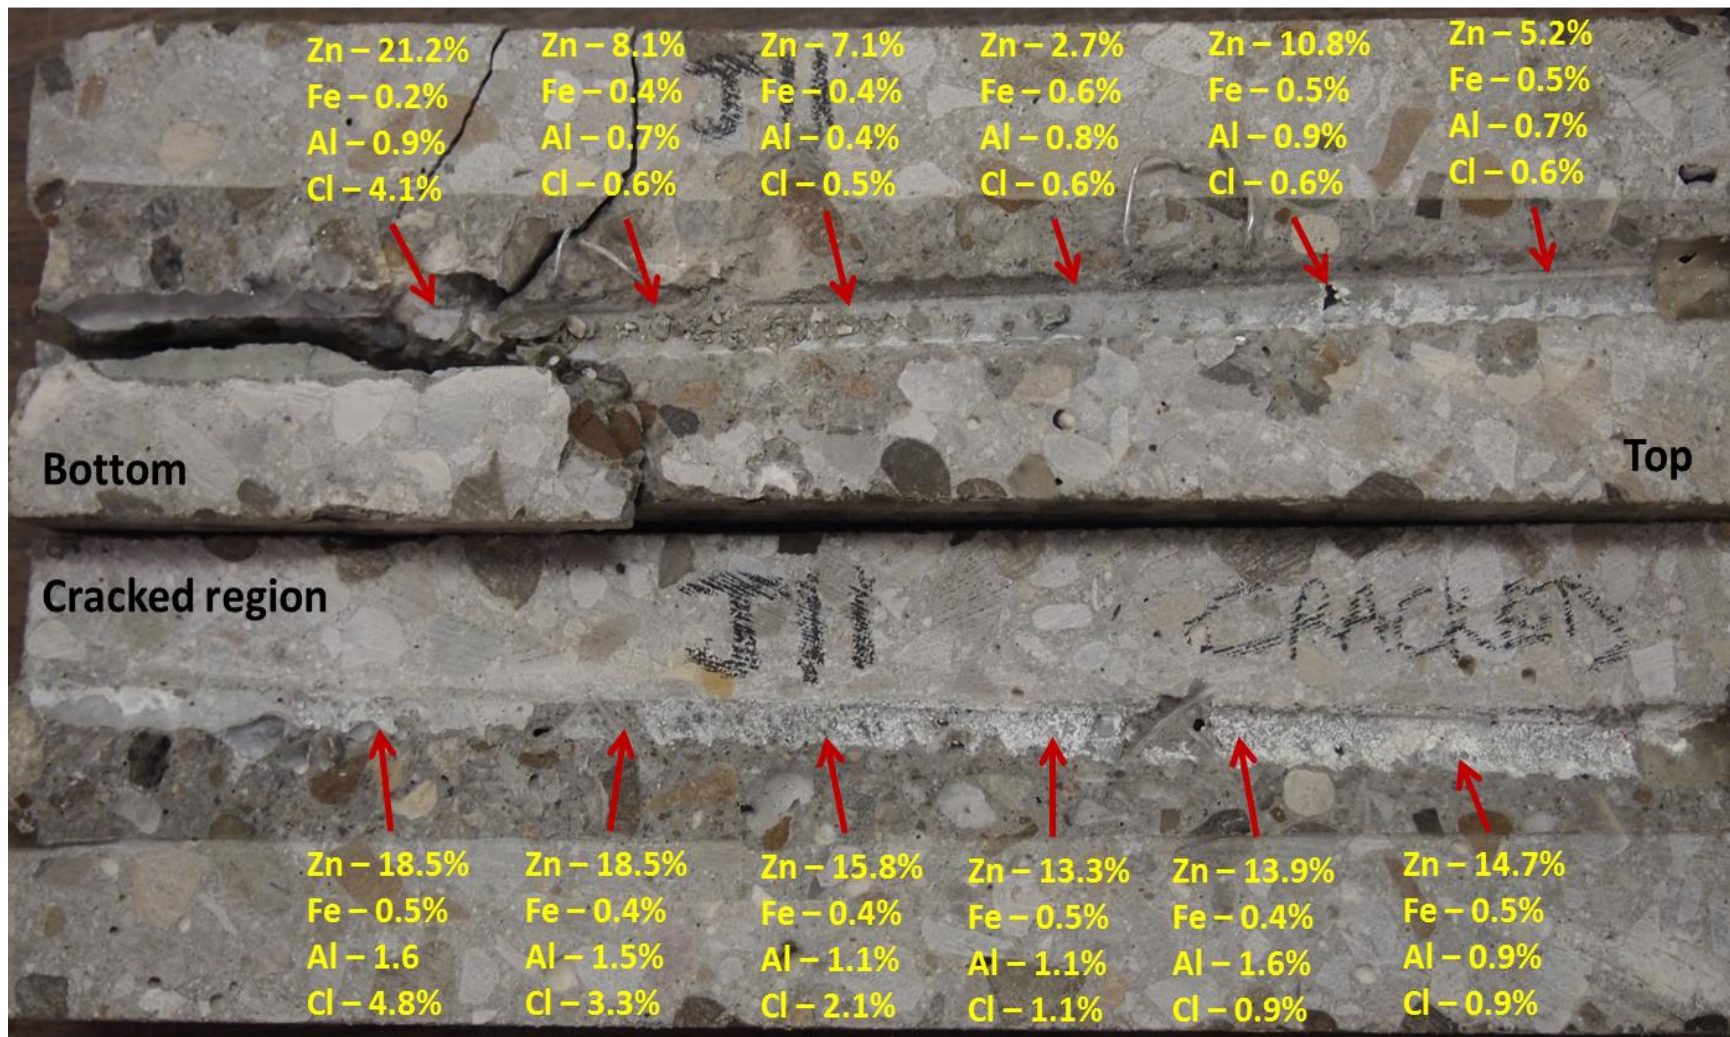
XRF analysis of autopsied longitudinally cracked C3 concrete specimen
